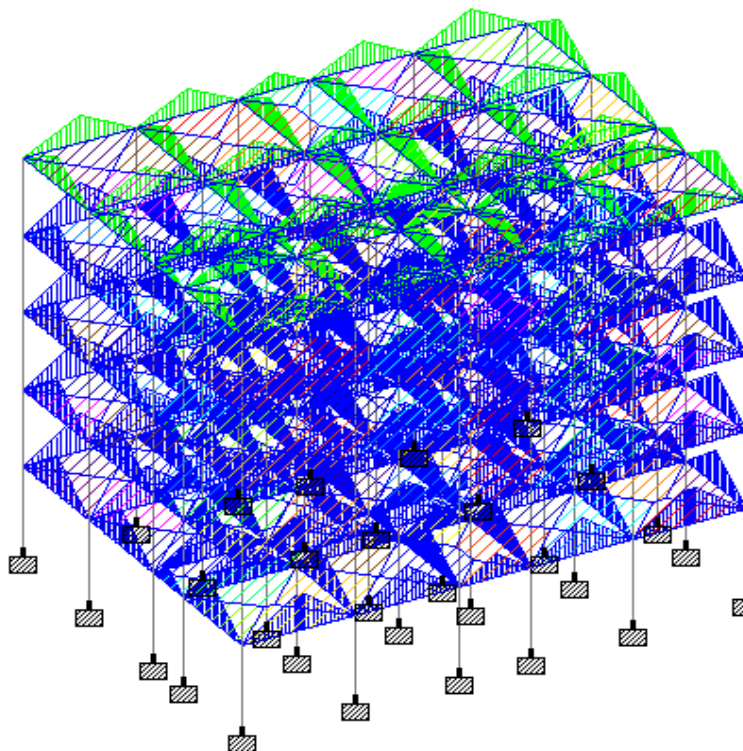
illustrates the live Load acting from 1st floor to the 4th
